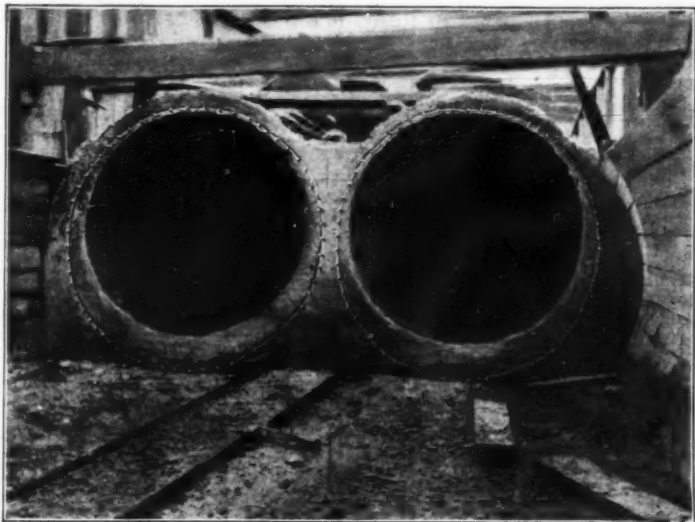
SECTIONAL VIEW OF CONCRETE CONDUITS REINFORCED BY ELECTRICALLY-WELDED FABRIC.
